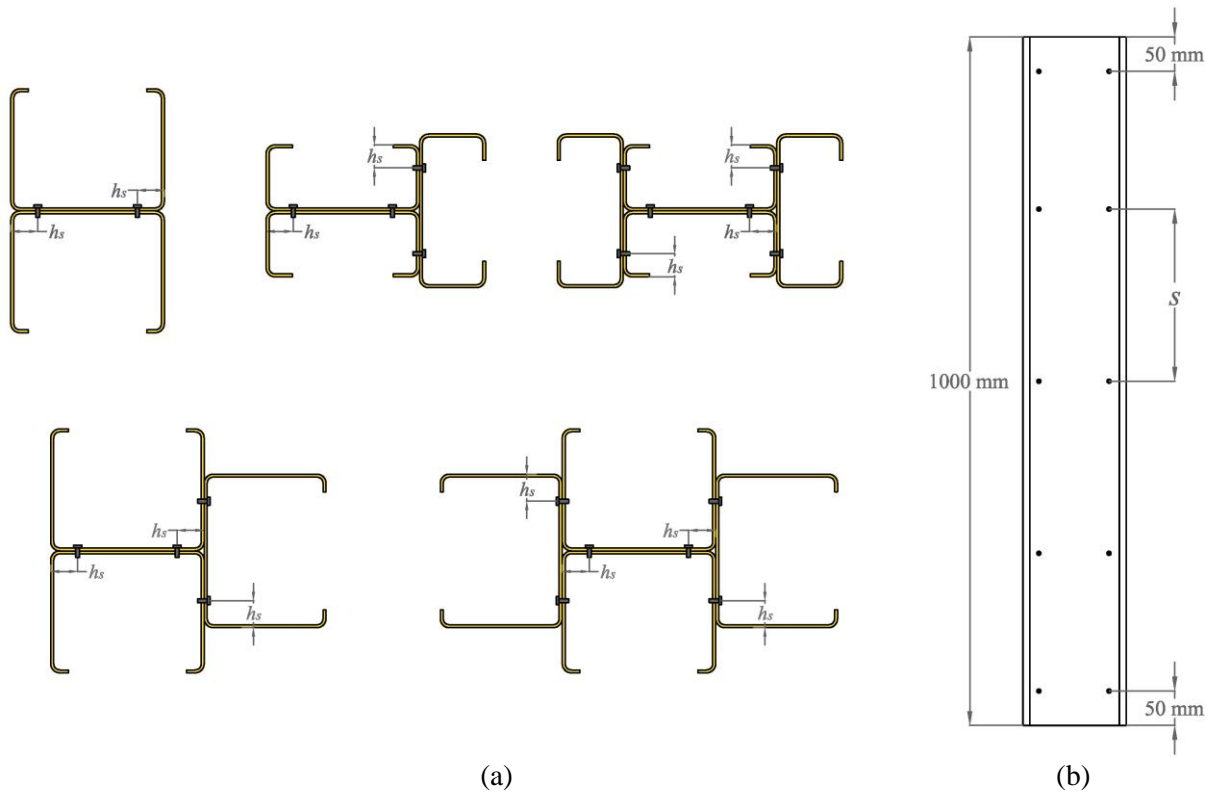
Configuration of built-up test specimens: (a) considered section assemblies, (b) longitudinal fastener arrangement
